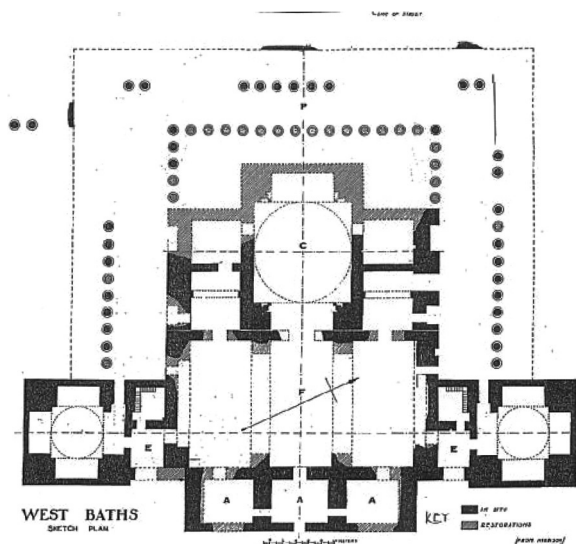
Jerash, plan of West Baths (after Kraeling 1938, plan XXVII)
